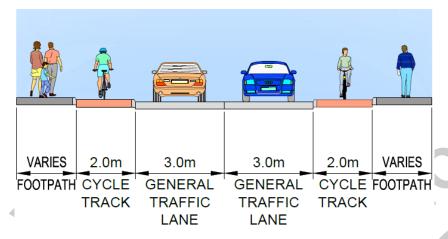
Section 1, Proposed Option 1 - Cross Section B-B
